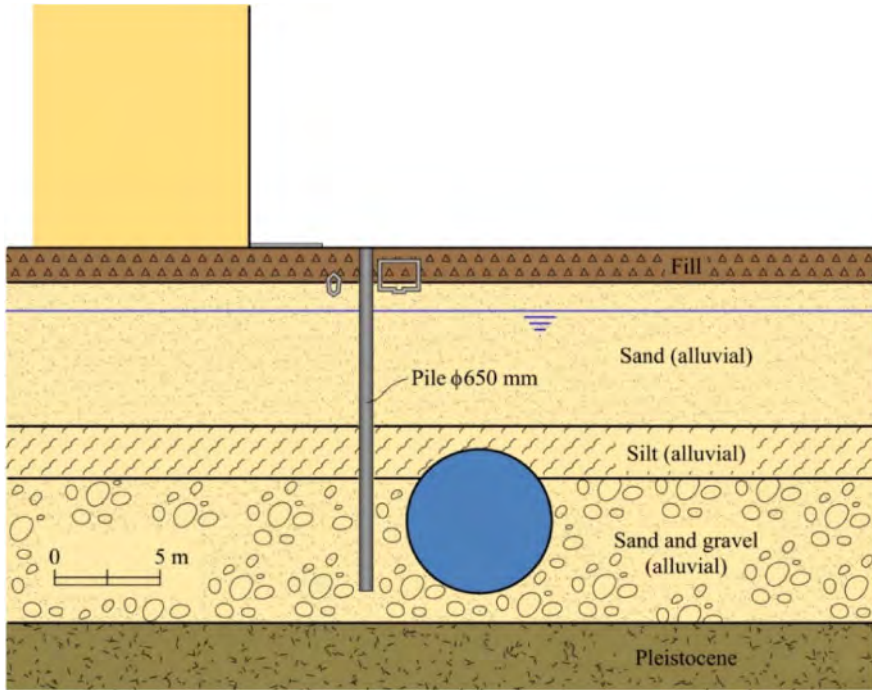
Pile wall protection against a metro tunnel in alluvial saturated soils in Barcelona. Di Mariano et al, (2007).
